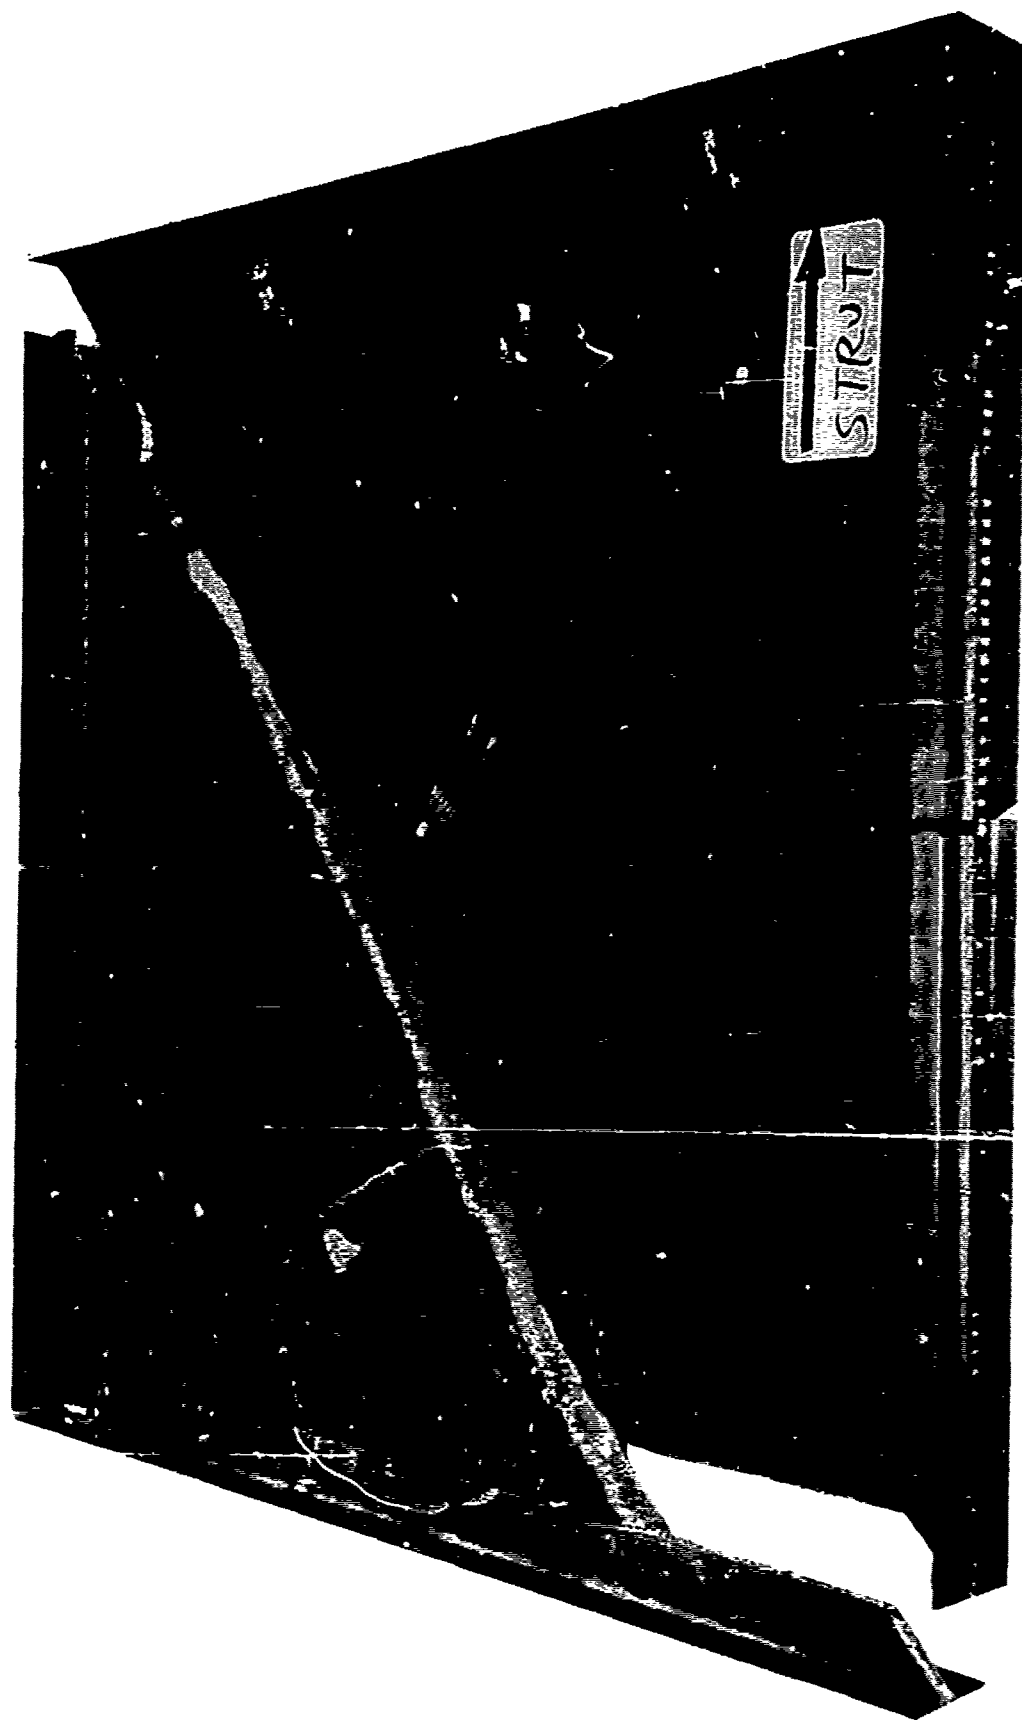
Test Specimen 3B1E2 After Failure, Back Side, Inplane Shear
